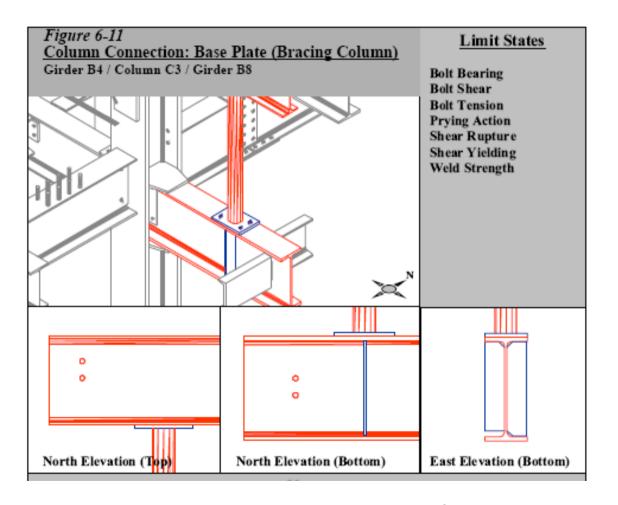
Column Connection: Base plate (bracing column) Girder B4 / Column C3 / Girder B8
